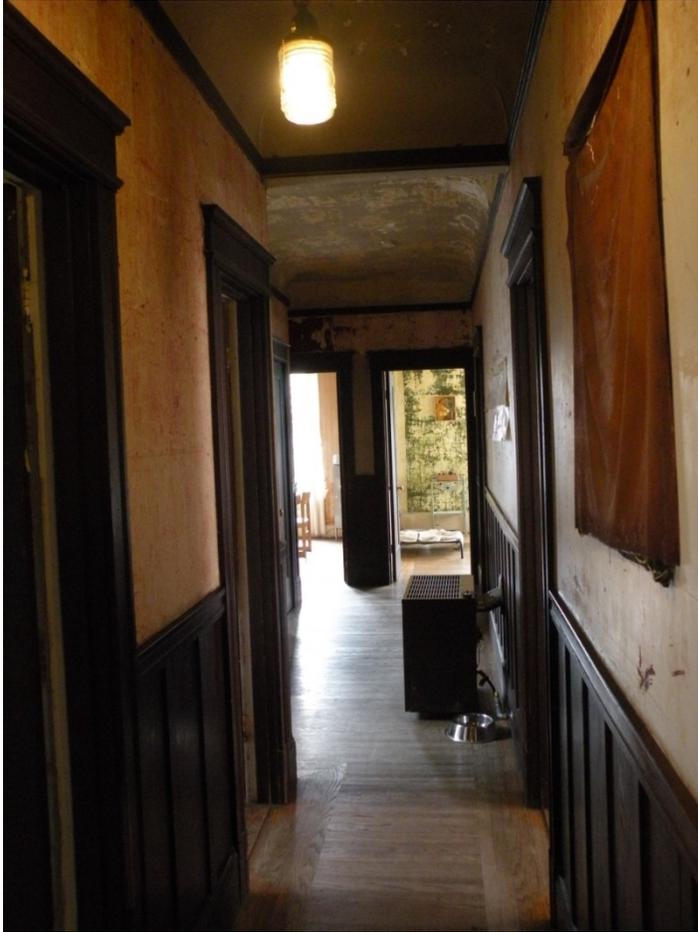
A view down the hallway of Rube Goldberg's apartment shows original finish on the woodwork including wainscoting, surrounds, picture rails, and floor. The hallway, like the rooms off of it, has high cove ceilings. A second gas heater from the third quarter of the 20th Century is set in the hallway.
